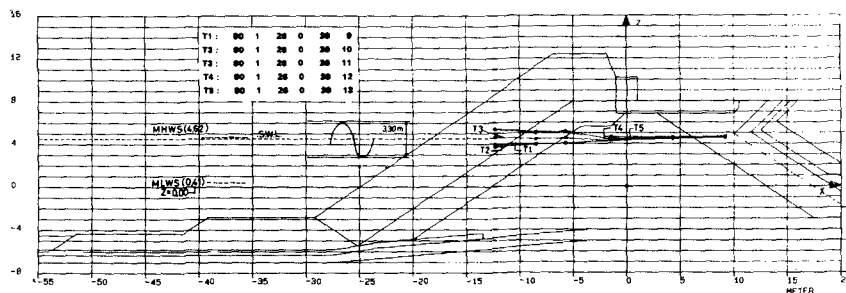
Cross-section of instrumented breakwater and example of wave damping
